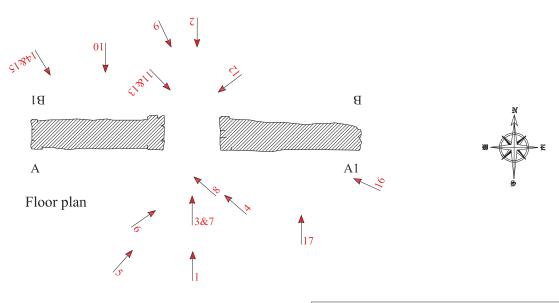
Pi Scale 1:75 at A4 Plan & elevations
